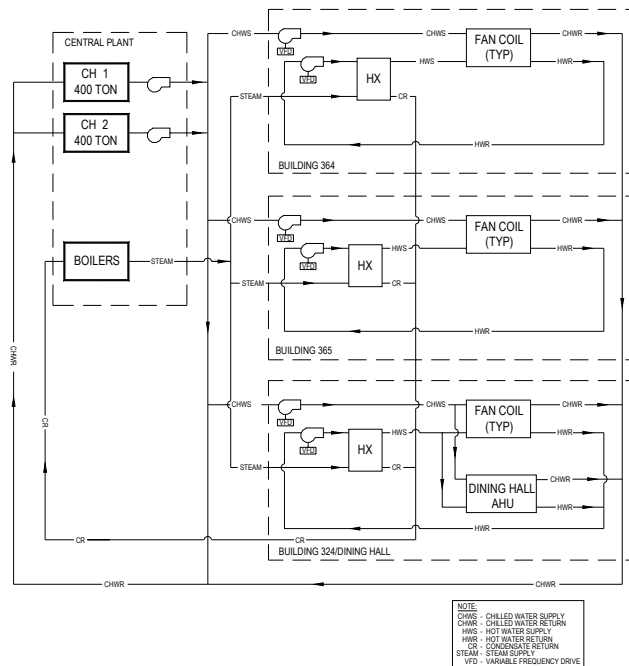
Schematic of Upgraded Central Plant and Chilled/Hot Water Loop
